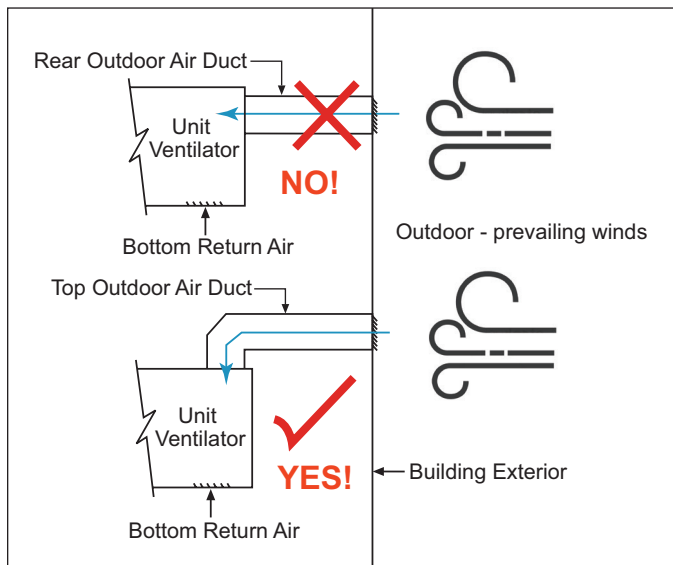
Outdoor Air Arrangement with Prevailing Winds
